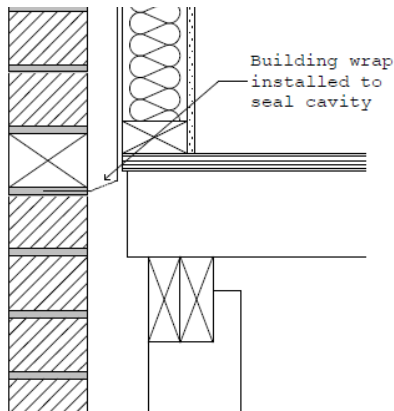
Diagram of wall cavity and subfloor obstruction (Dewsbury 2011)
